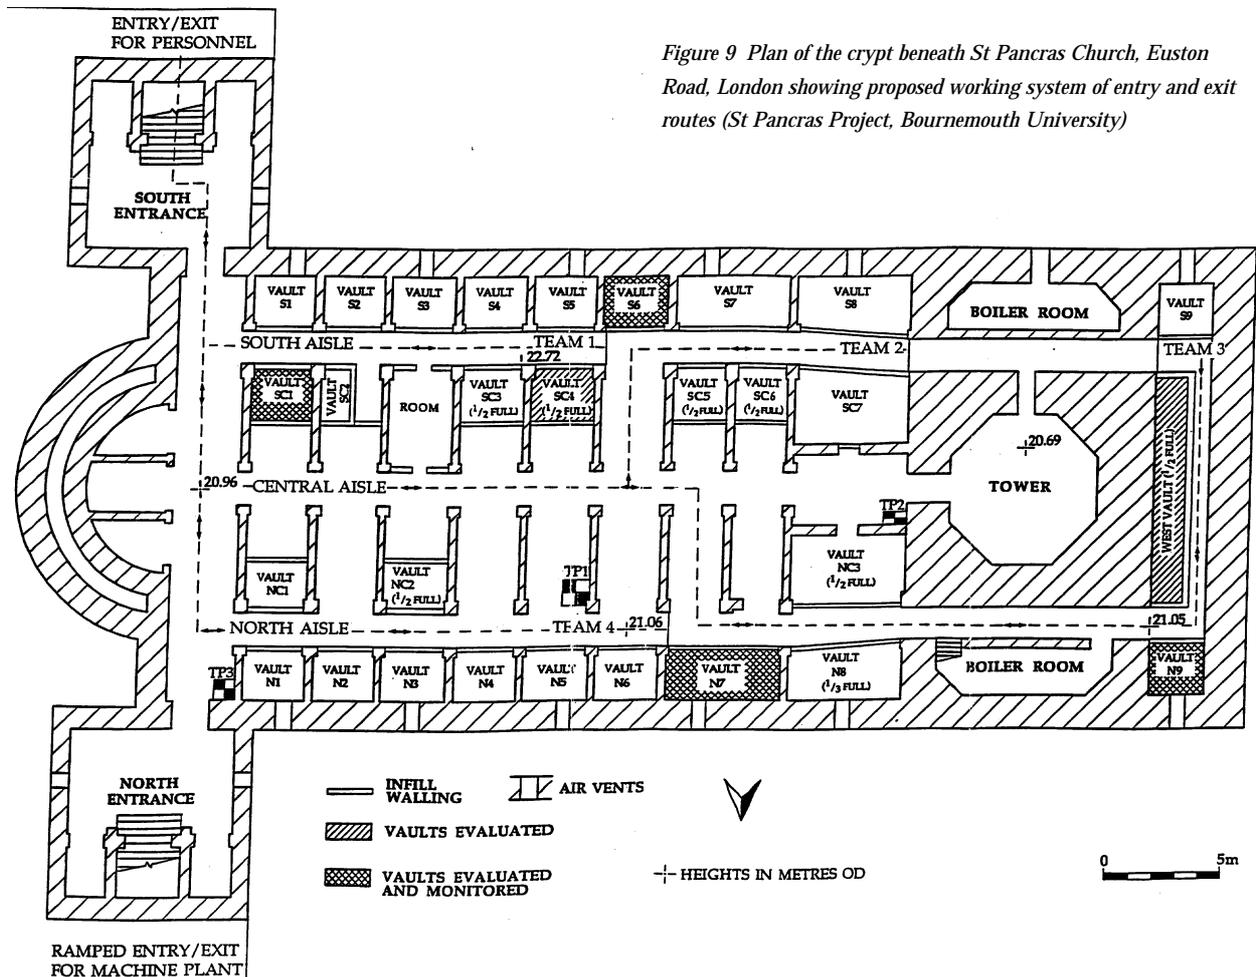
Plan of the crypt beneath St Pancras Church, Euston Road, London showing proposed working system of entry and exit routes (St Pancras Project, Bournemouth University)
